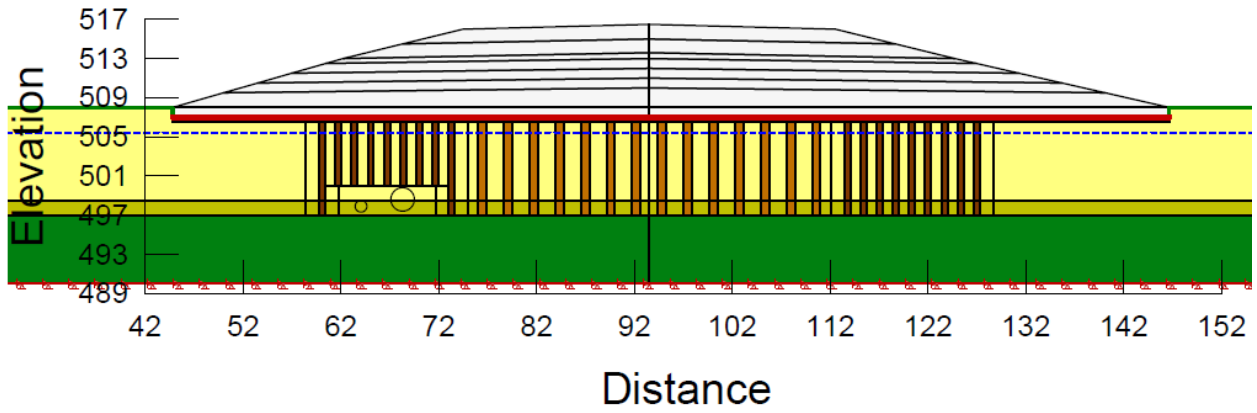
FEM South Abutment Cross-Section Model In-situ Stage
